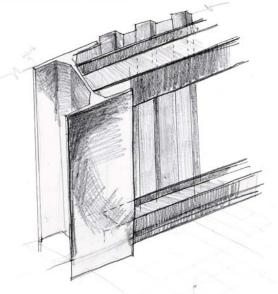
Fixing of IBR sheeting to main steel structure. View from inside Scale : not to scale (Author, 2008)
